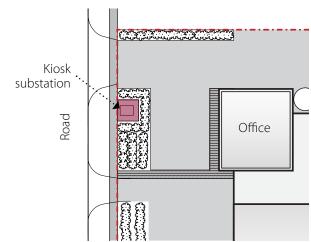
Locate kiosk substations within site setbacks where possible
